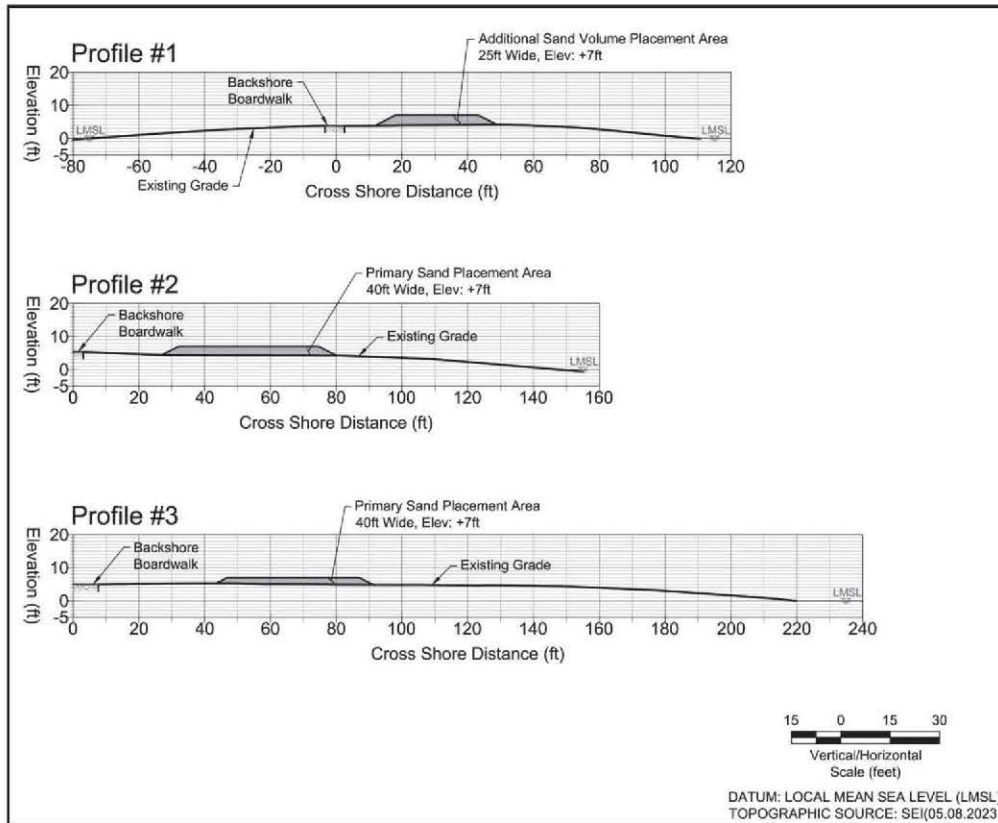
Existing and proposed beach profiles. The placed sand crest will be at elevation +7 ft, which is about 2 feet higher than existing ground. The placed sand will be 25 to 40 feet wide.
